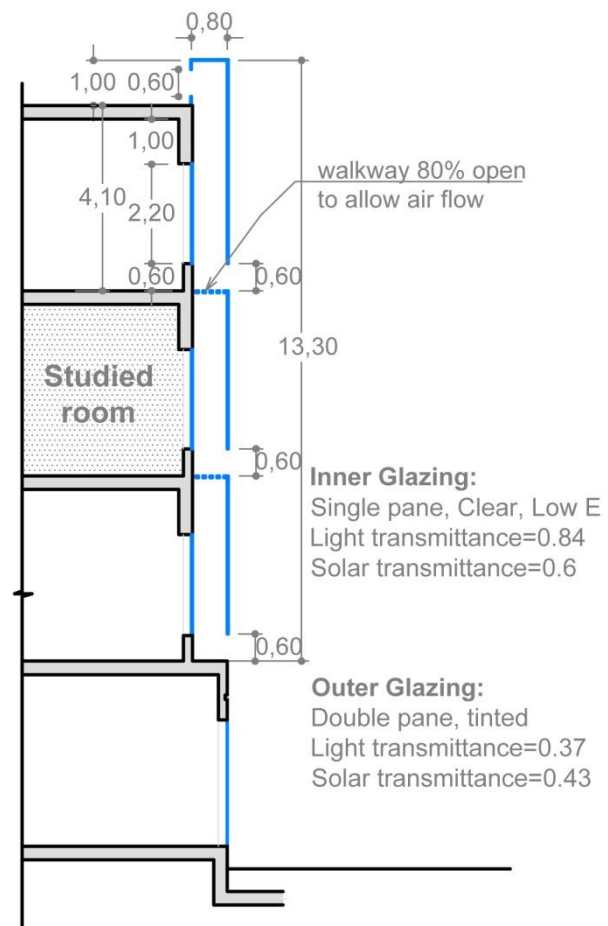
Schematic wall cross-section of the B-19 building with a flat DSF added to it. Source: author.
